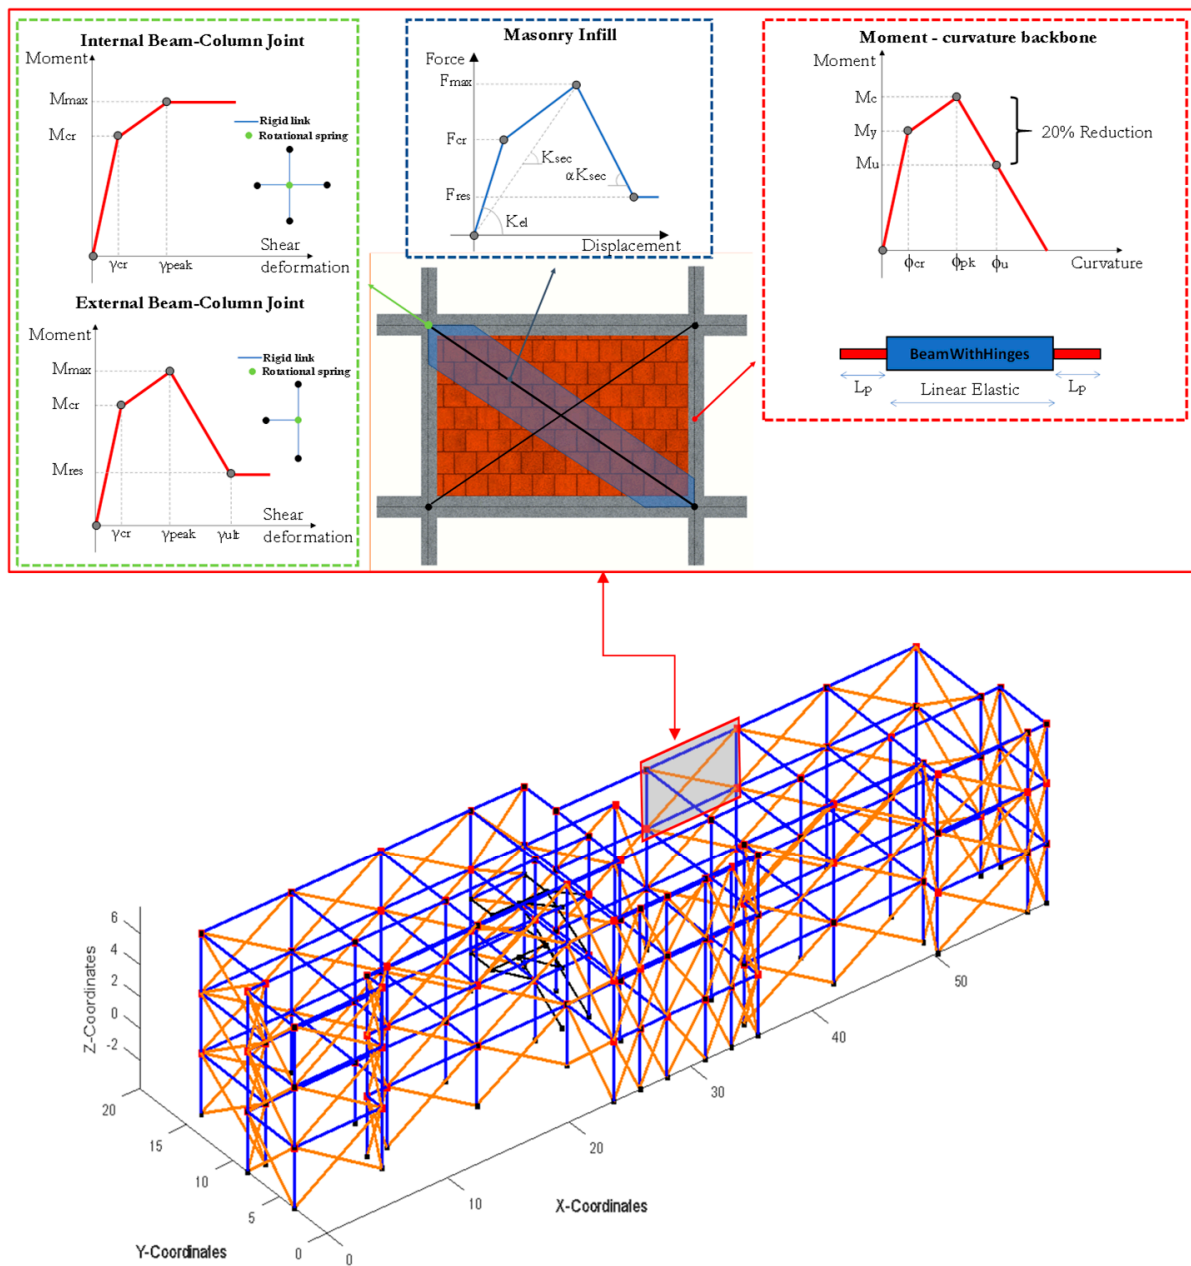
Case-study school building model in OpenSees [23] and illustration of the numerical modeling approach for masonry infill, frame elements, and beam-column joints.
